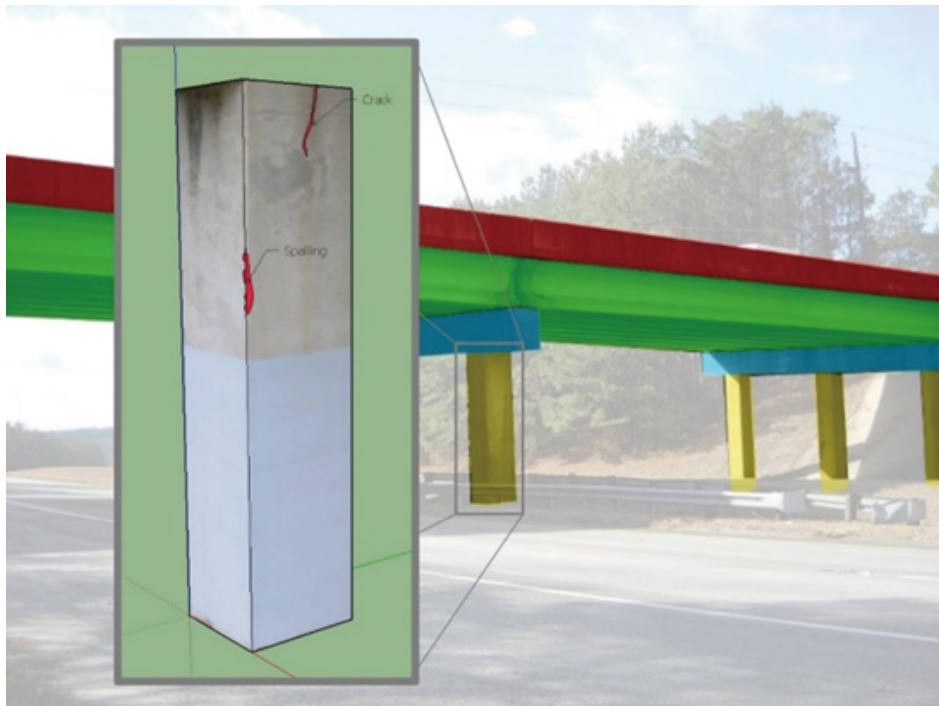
Crack and spalling on a bridge pier (Ioannis Brilakis' presentation at the workshop)
